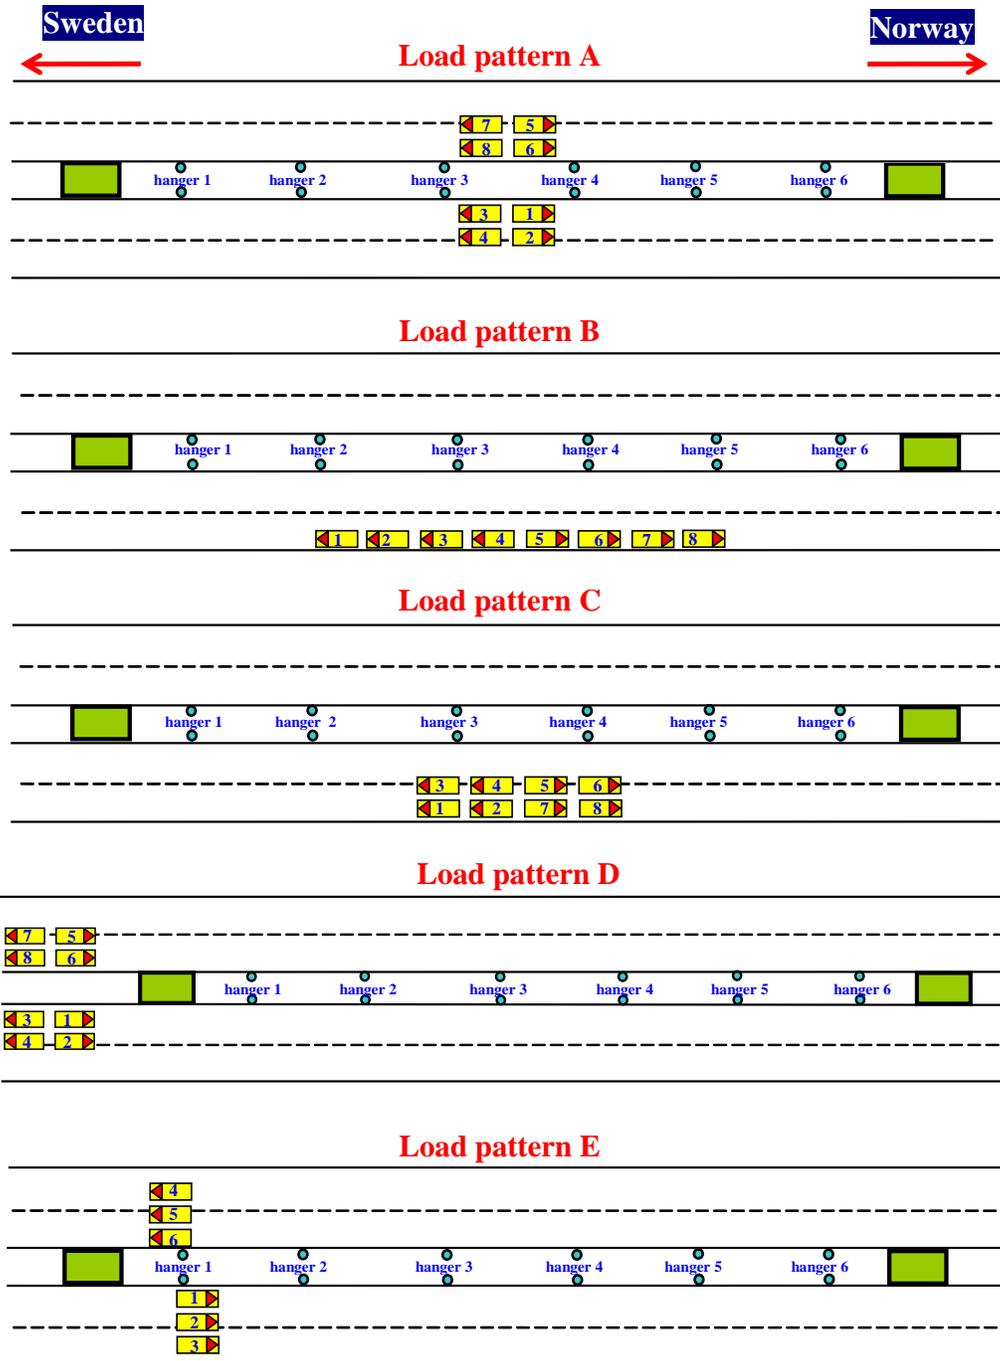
The 5 main loading patterns A-E showing lorry positions on the bridge. As can be seen, the lorries were positioned back-to-back in order to have a symmetric loading and for maximum load effects.
